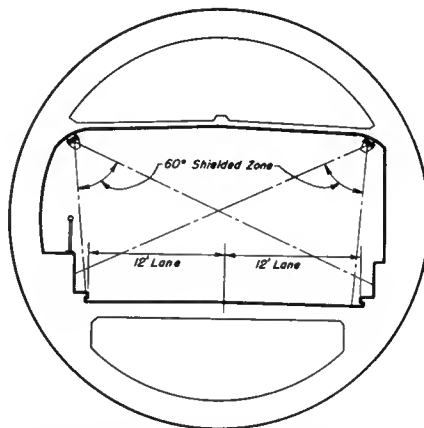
Typical cross-section of tube showing fixture orientation and illustrating shielding and light control.
